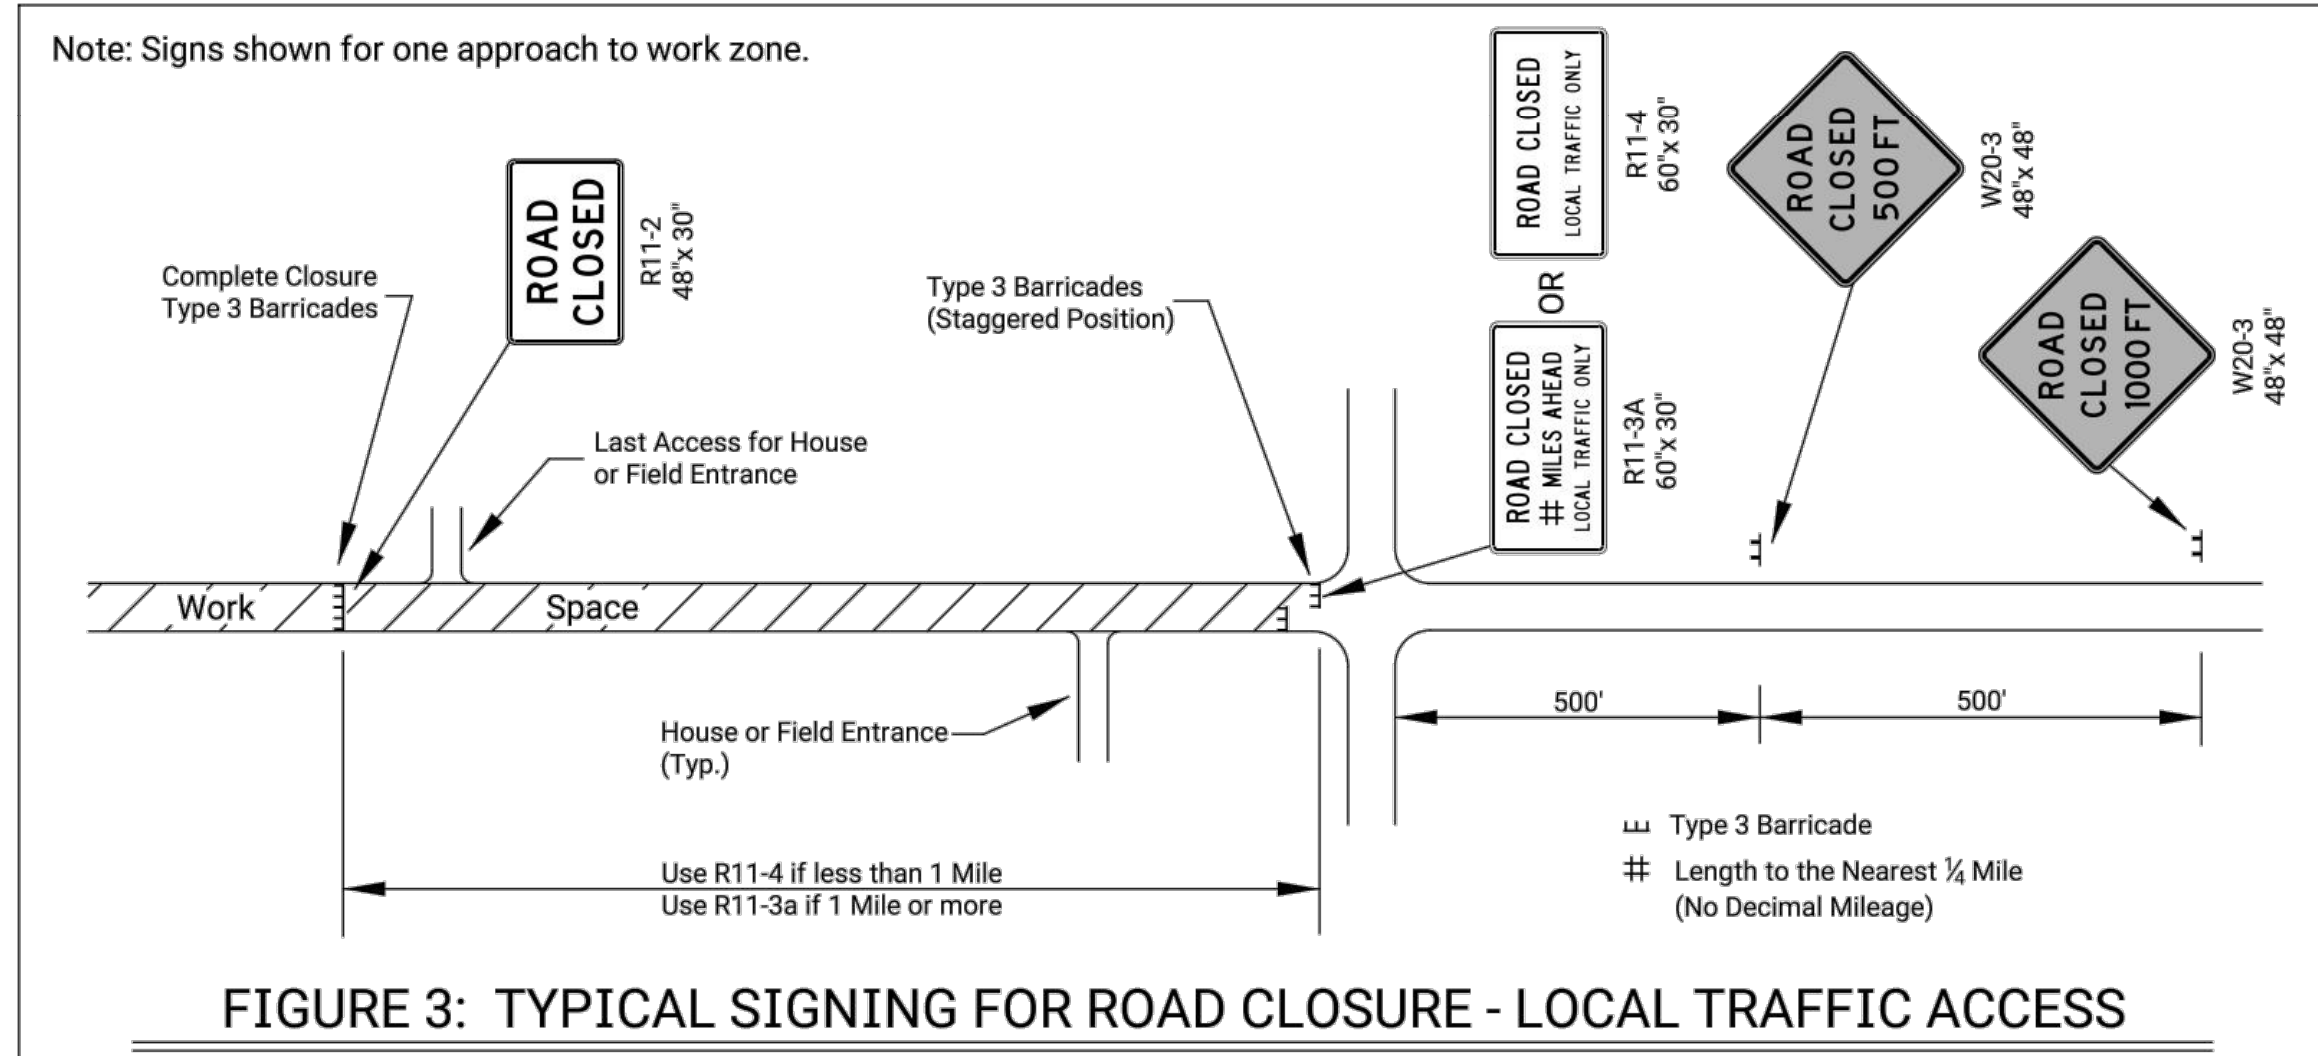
TYPICAL SIGNING FOR ROAD CLOSURE - LOCAL TRAFFIC ACCESS
